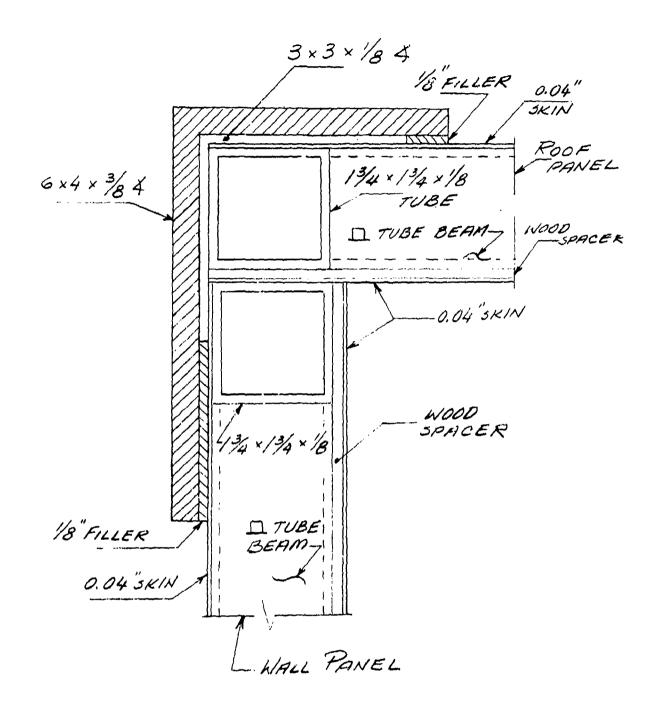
Roof to Wall Joint, Reinforced (Typical, except Roof to A/C End Wall (see Fig. 6). Shaded Parts are Reinforcements.)
